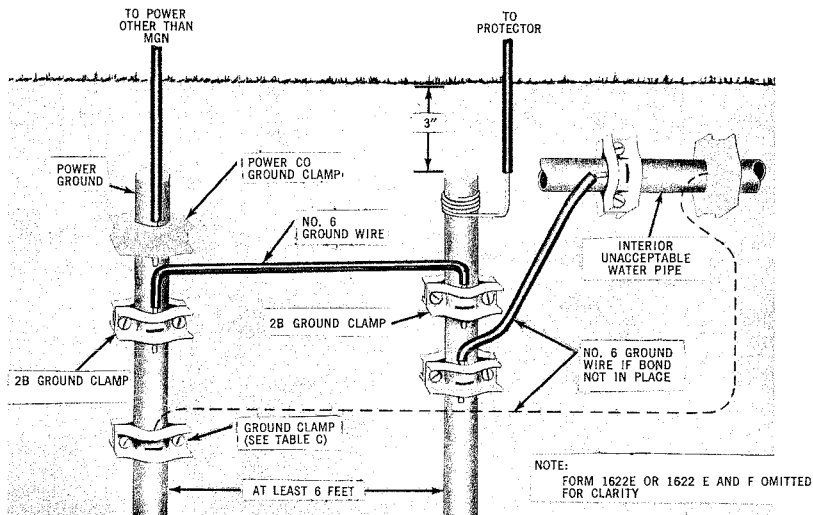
Power Other Than MGN Grounded to Grounded Rod Unacceptable Interior Water Pipe
